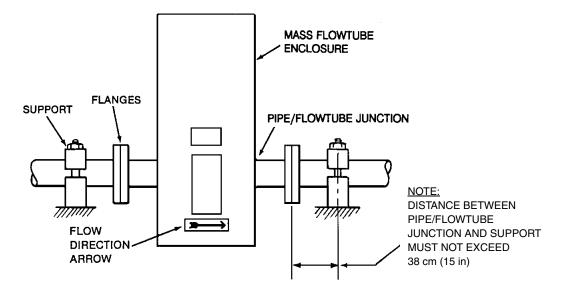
Flowtube Mounting with Flanged End Connections - Horizontal Pipeline
